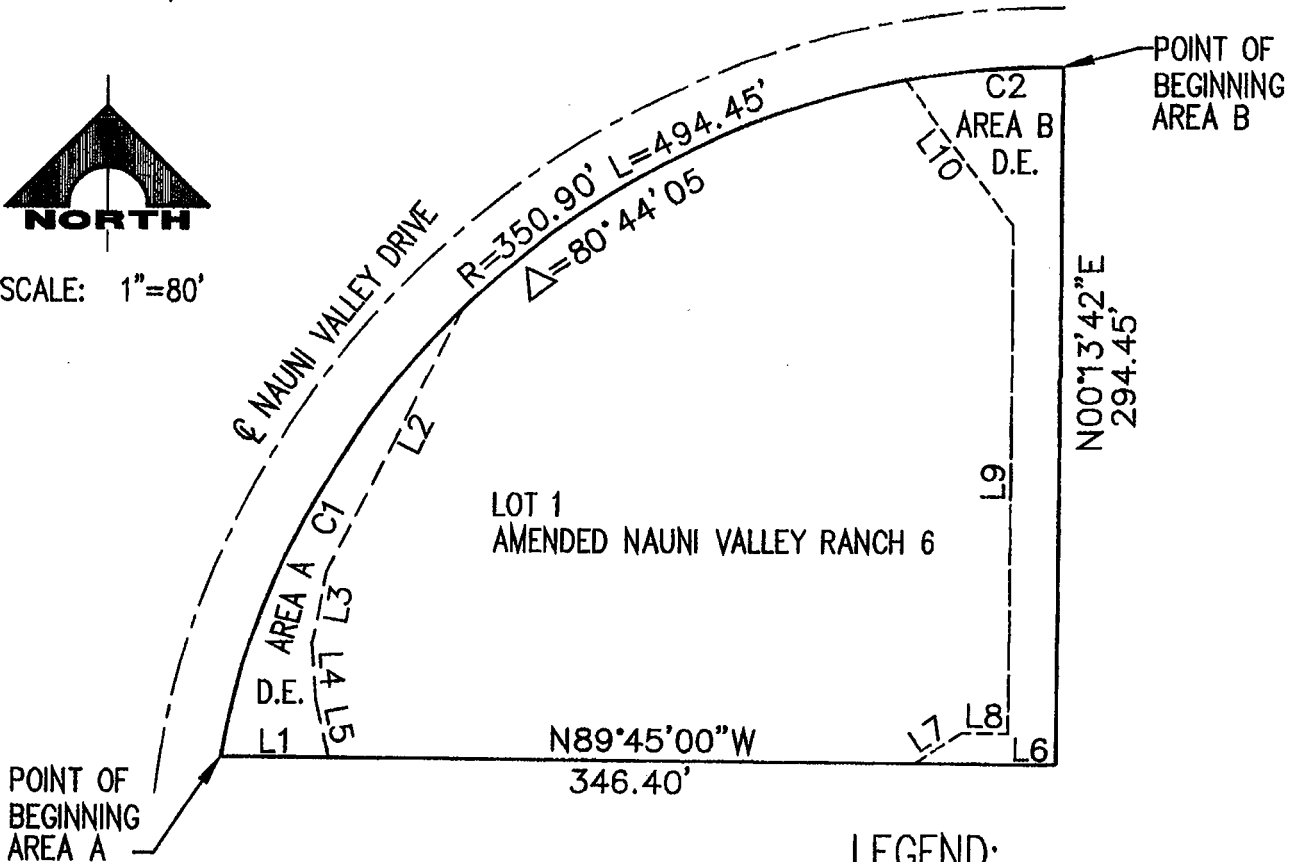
EXHIBIT B DRAINAGE EASEMENT EXHIBIT LOT 1, AMENDED NAUNI VALLEY RANCH 6
